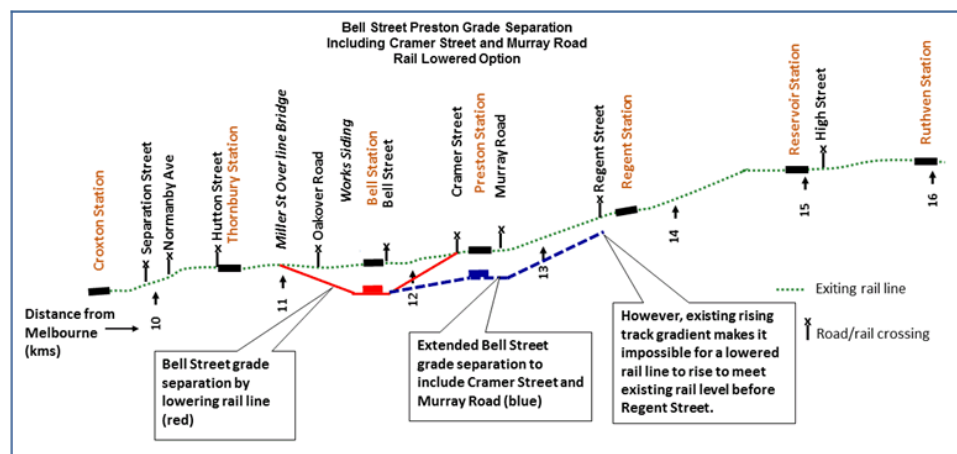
Bell Street grade separation rail lowered scenario extended to Cramer St and Murray Rd
